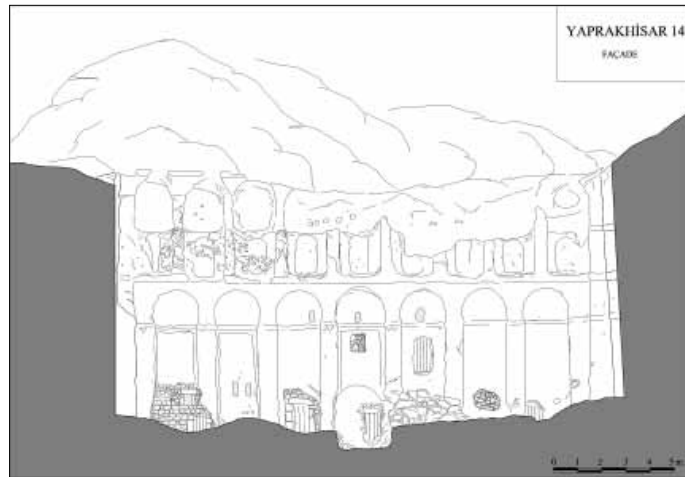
Yaprahisar 14, elevation drawing of the courtyard façade
